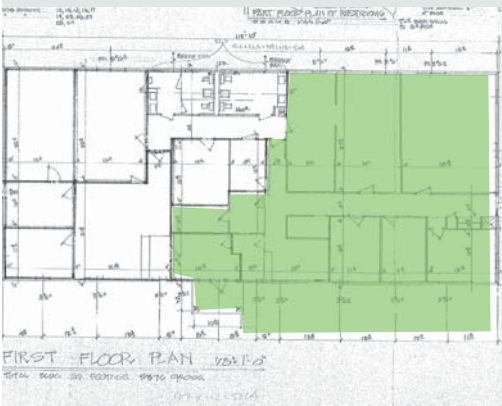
Existing Floor Plan of FSA-SCD Building with Non-Shared SCD Suite Spaces Highlighted
